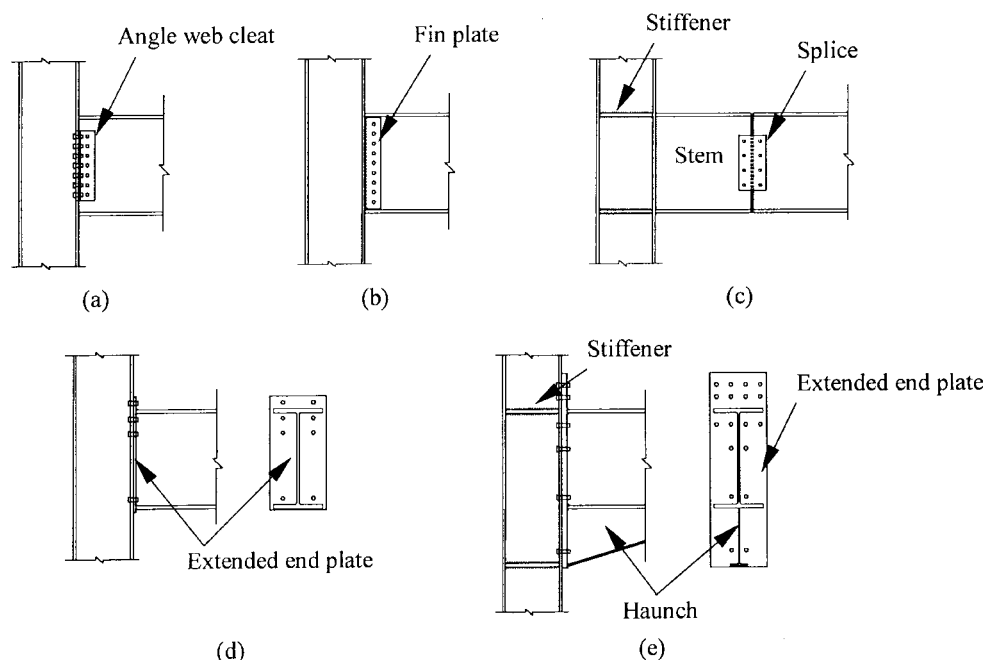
Details of beam-to-column connections: (a) Simple connection with angle web cleats; (b) Simple connection with fin plates; (c) Continuous Stem Girder connection; (d) Semi-continuous connection; and (e) Continuous connection
